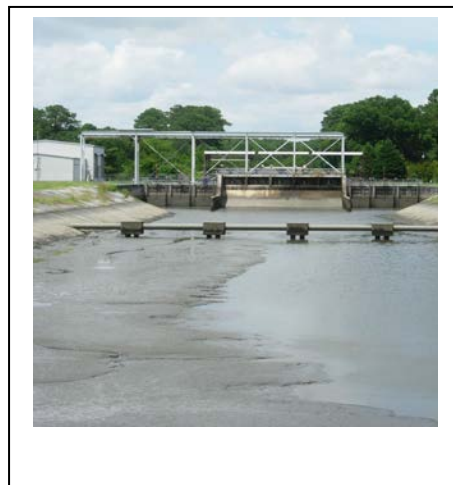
View of Casey Canal Looking North from Montgomery Crossroads
